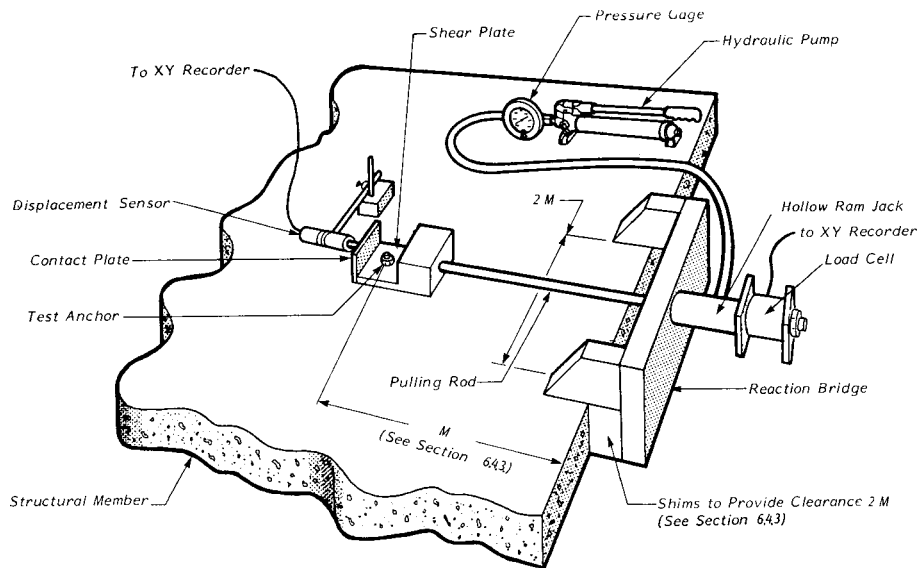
Typical Method of Applying Shear Loads to Anchors Attached to Structural Members—Direct Loading Method
